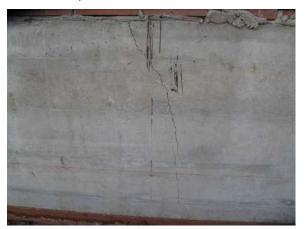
View of fracture in exposed beam near east end of south gymnasium wall
